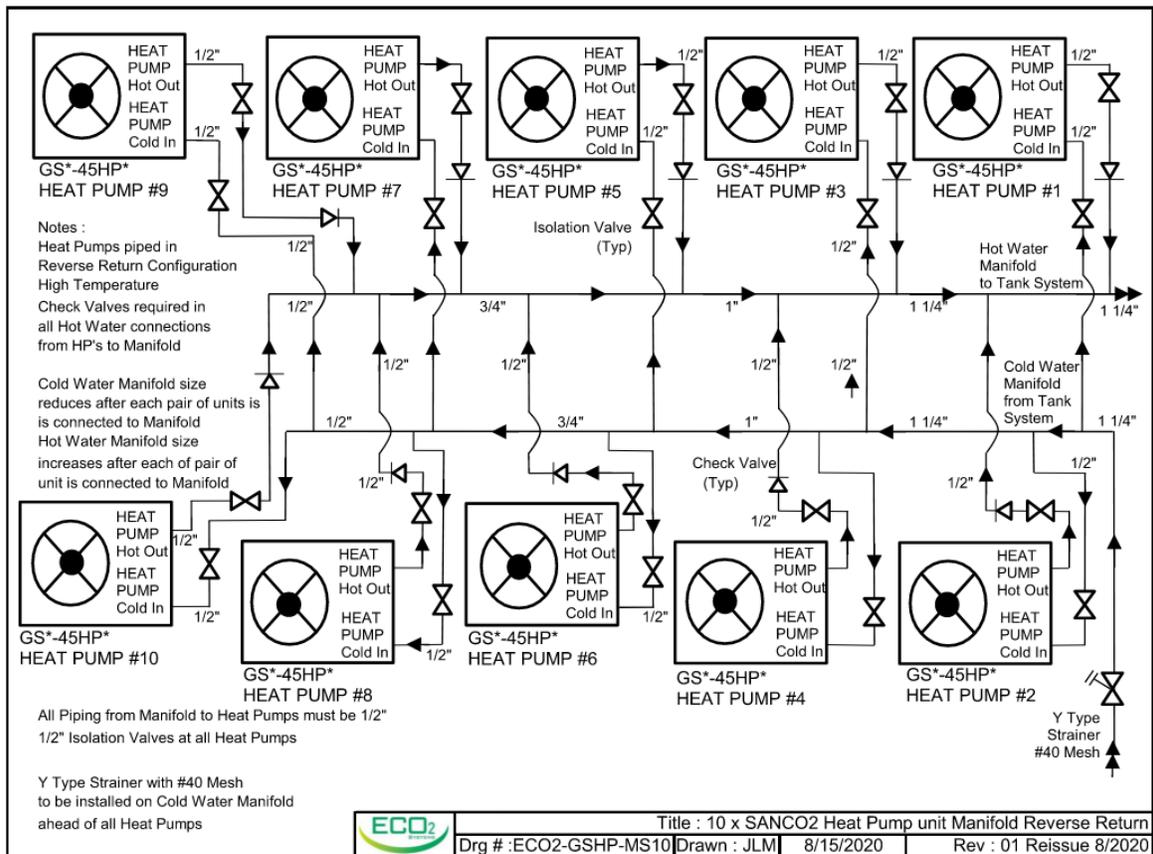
Small Planet Supply Typical Heat Pump Arrangement
